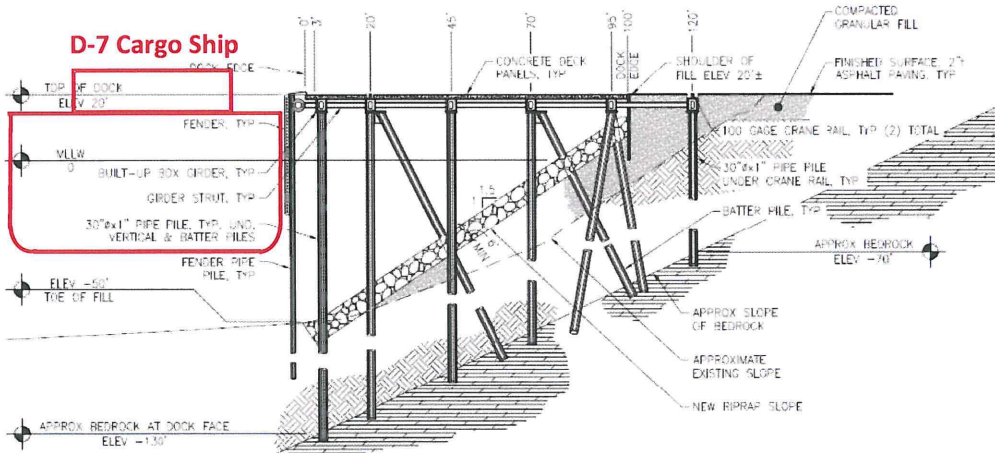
Kodiak Pier III Replacement - Pile Supported Alternative
